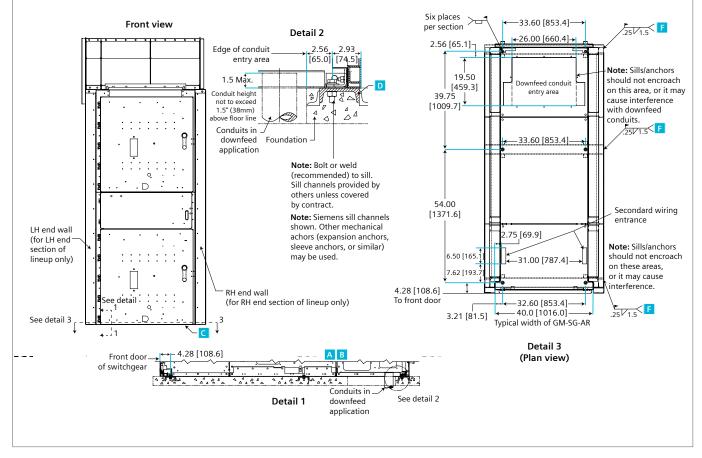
Anchoring indoor type GM-SG-AR switchgear rated up to 17.5kV
